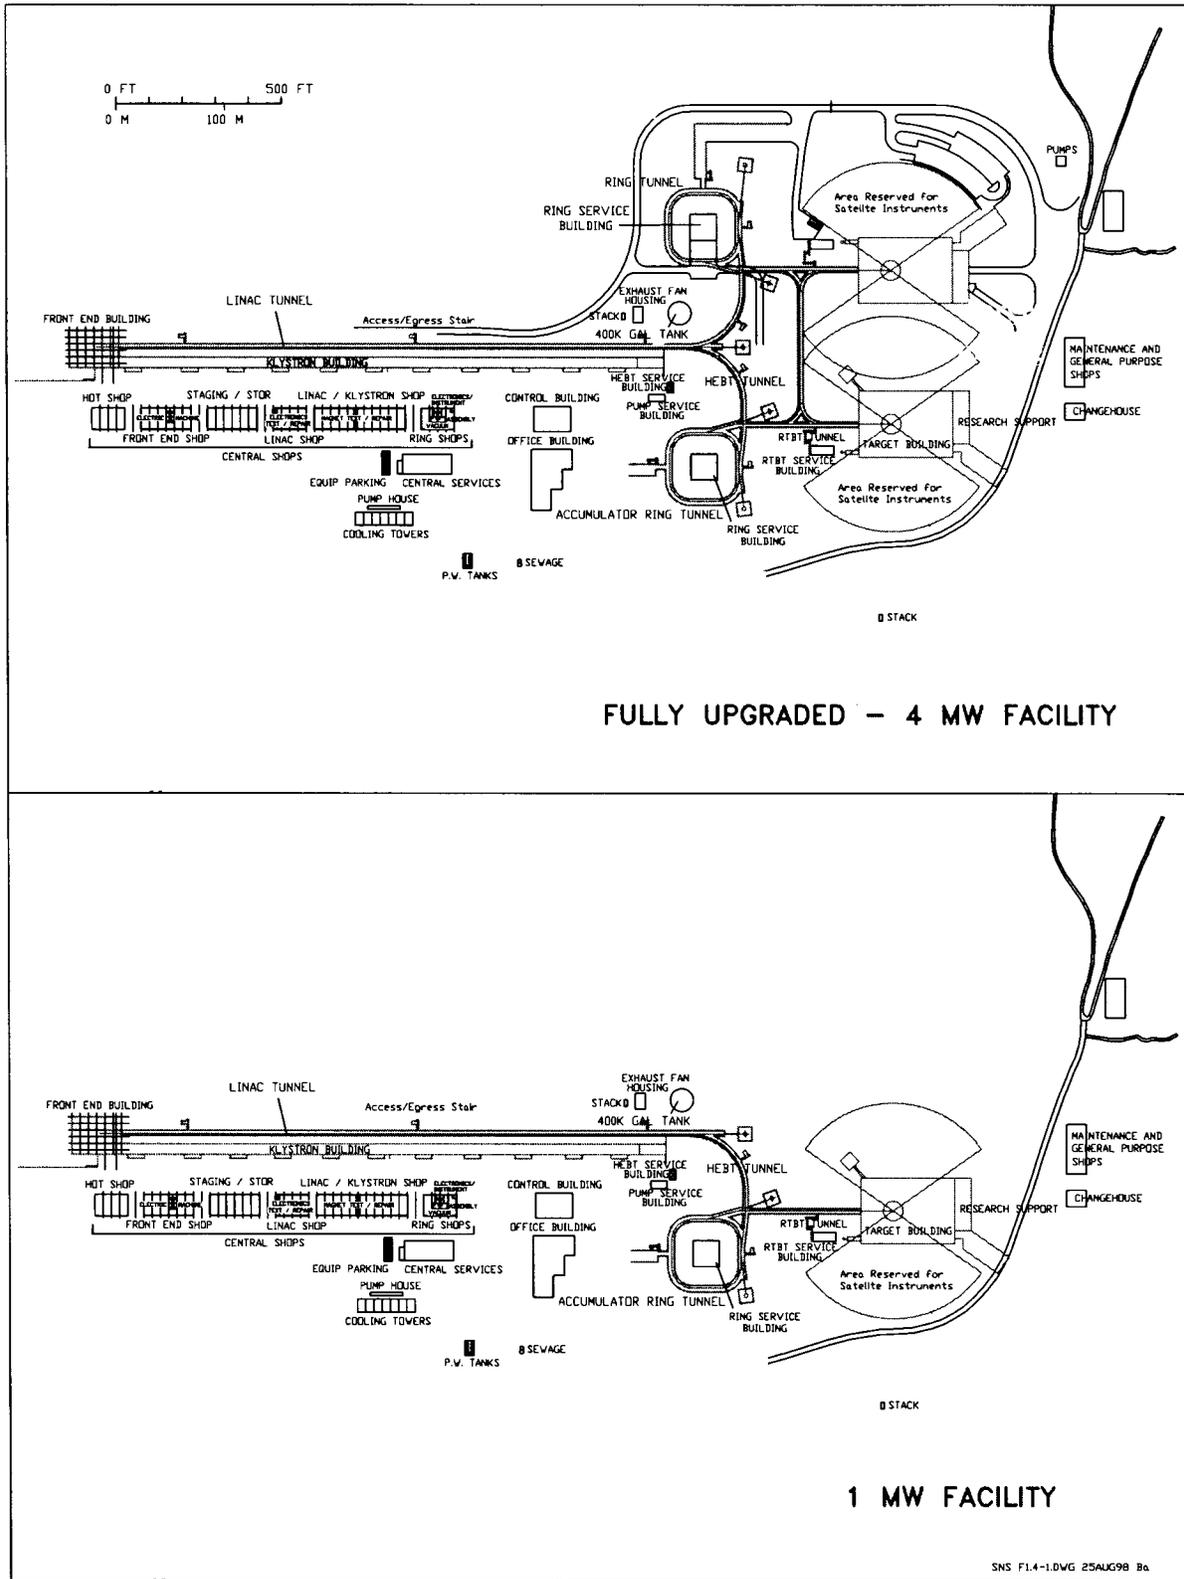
Footprint of SNS accelerator components.
